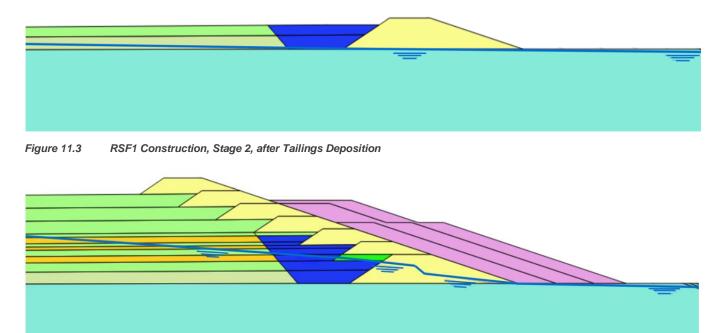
RSF1 Construction, Stage 8, before Tailings Deposition
